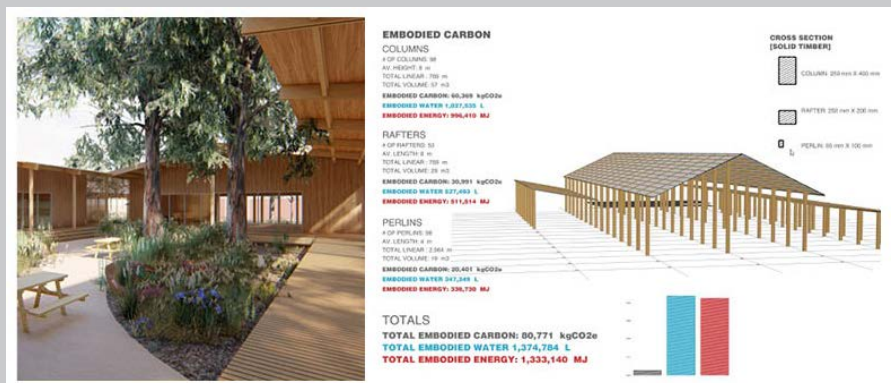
Ravensthorpe project was used as a testbed for new tools we are developing for design of timber structures.
